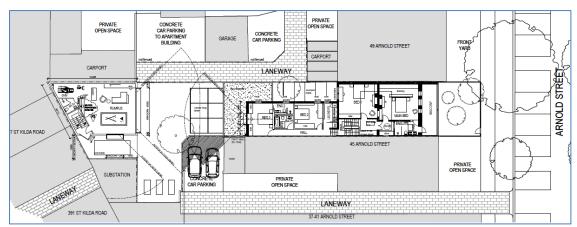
Extract of proposed first floor plan (Source: applicant)
